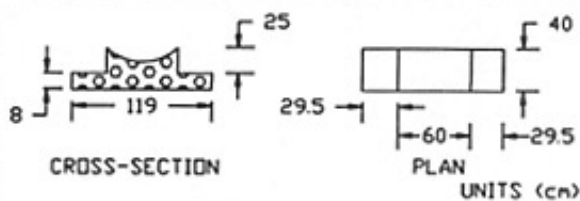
Supporting pad (unit:cm) (a) cross section. (b) plan.
